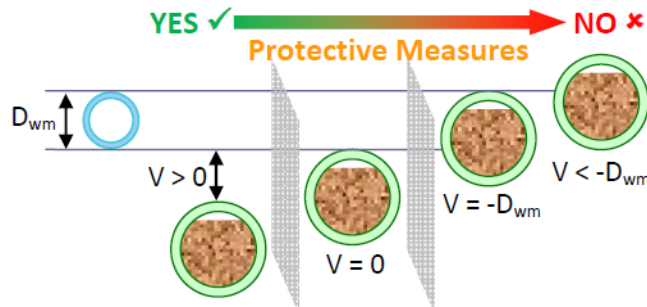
Vertical separation of watermain (blue pipe) and parallel pipe (green filled pipe). A continuous hydraulic barrier (grey plane) is shown for different vertical separations between pipes.
